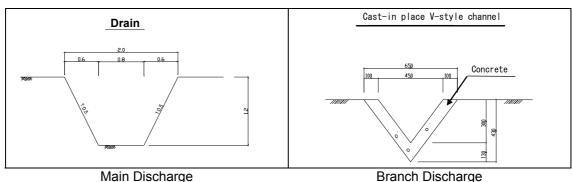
Drainage Plan of Rainwater and Domestic Waste Water at SMCDS
